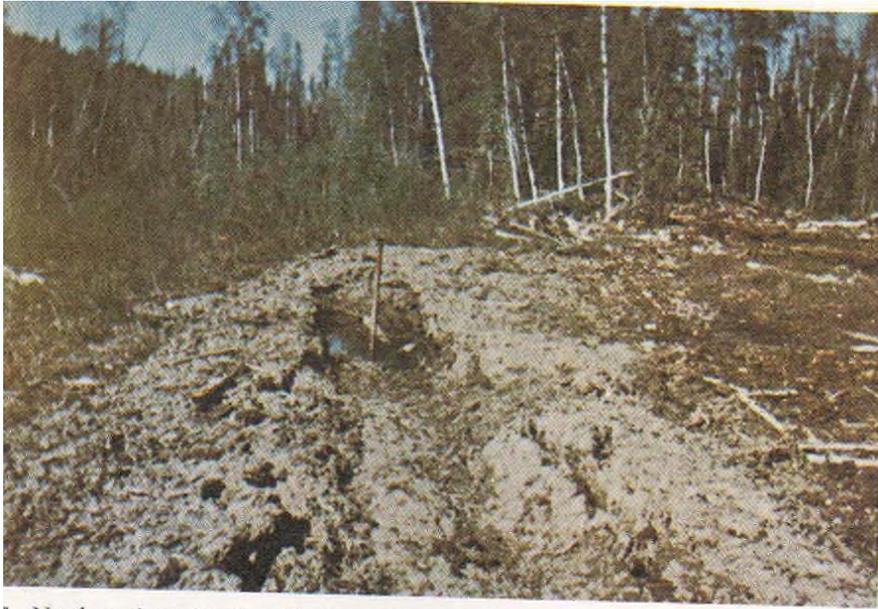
Ditch configurations, Fairbanks frost heave test facility
